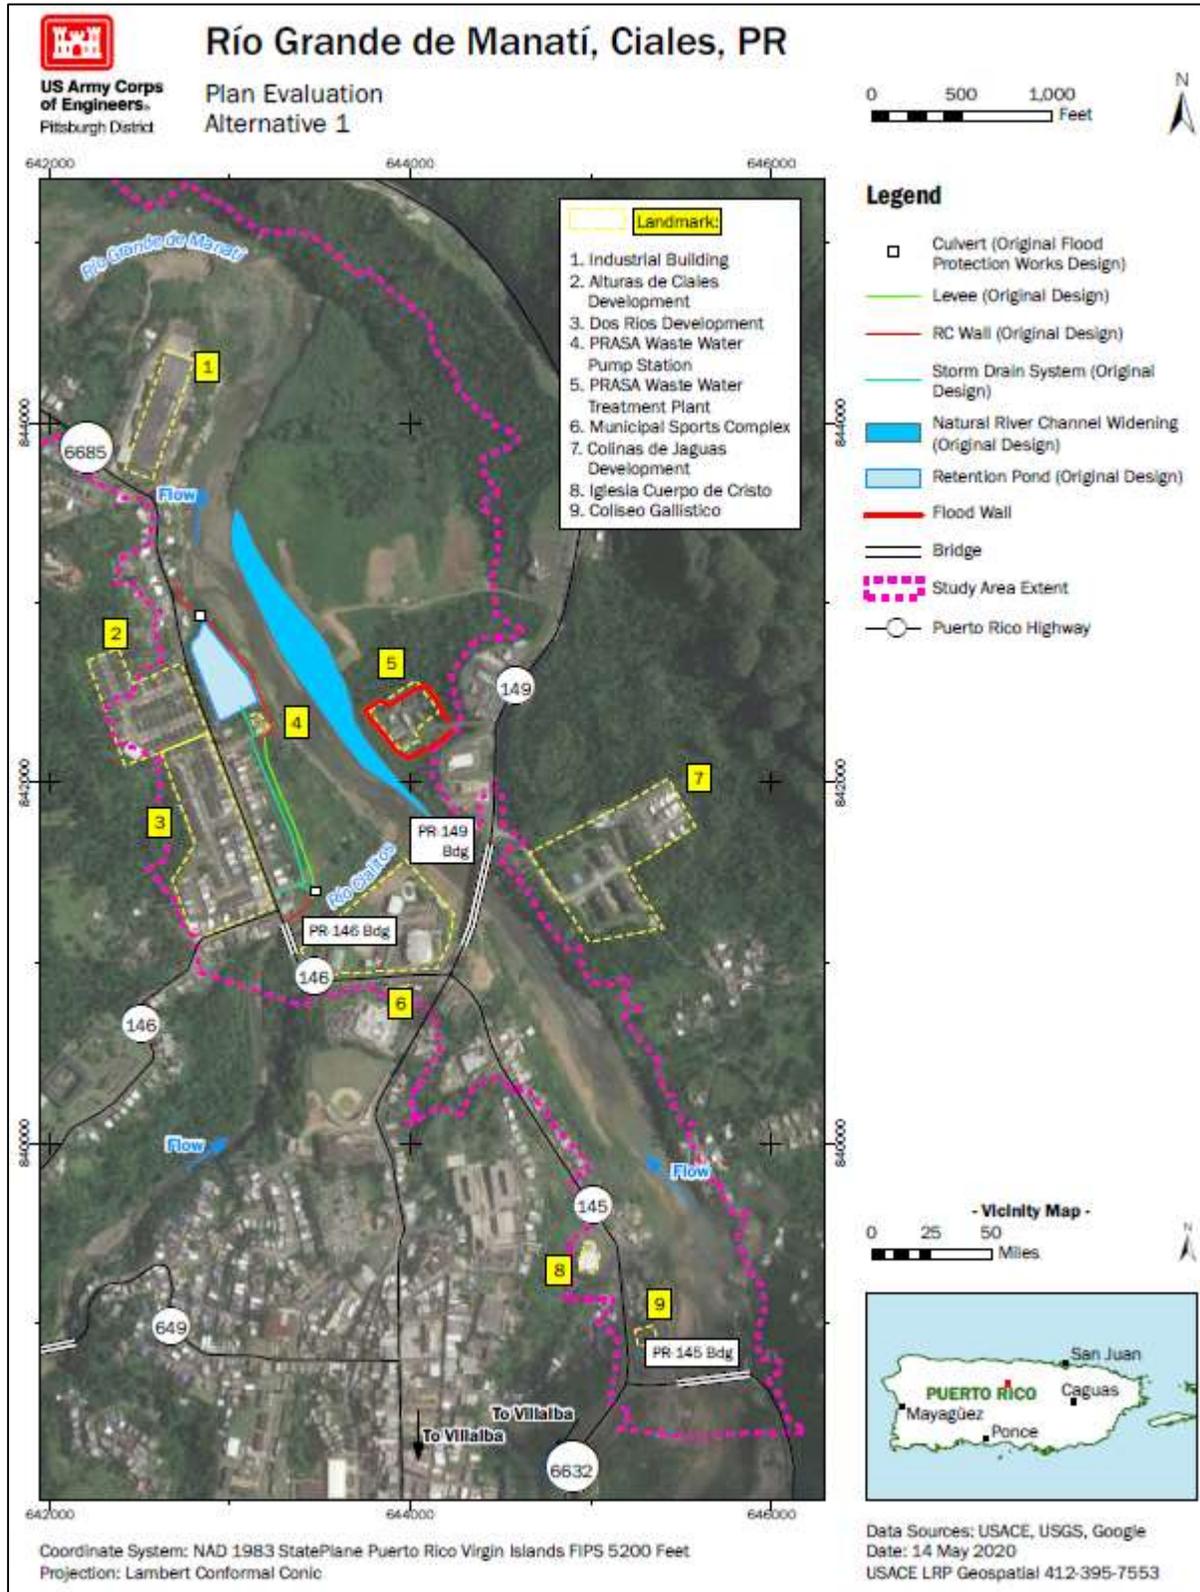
Conceptual plan view of Alternative 1 (Levee/Floodwall System).
